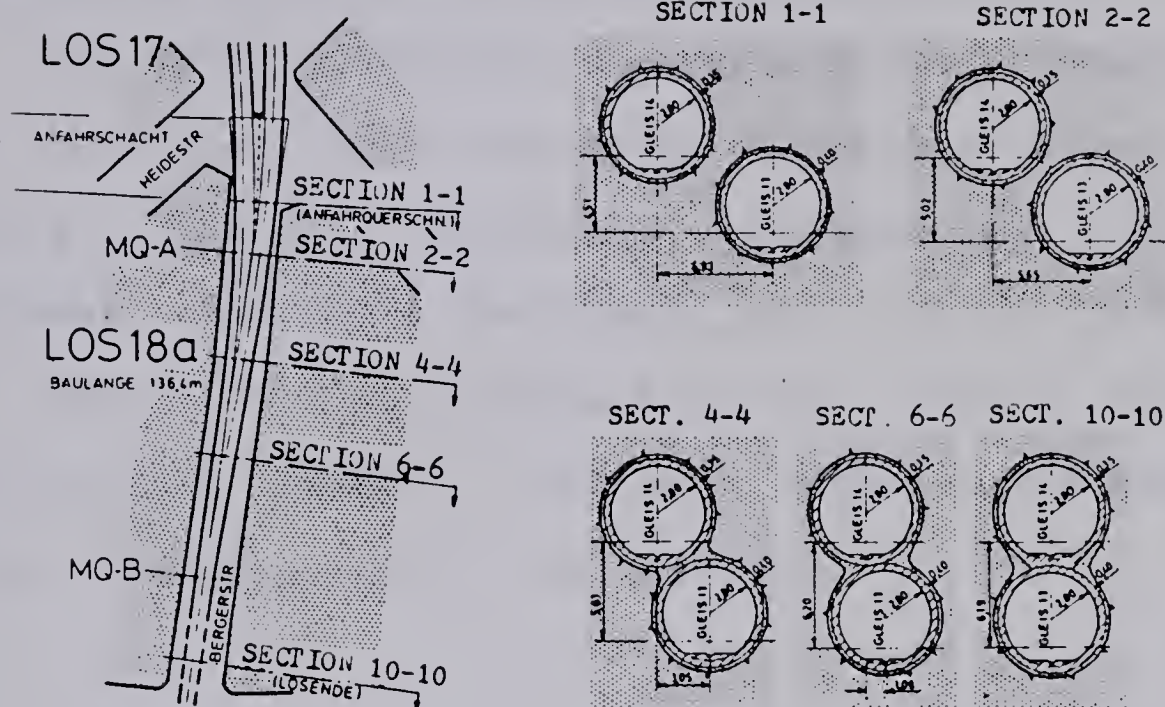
Plan view and cross-sections – Frankfurt Baulos 17/18a (after Sauer, 1974:modified)
